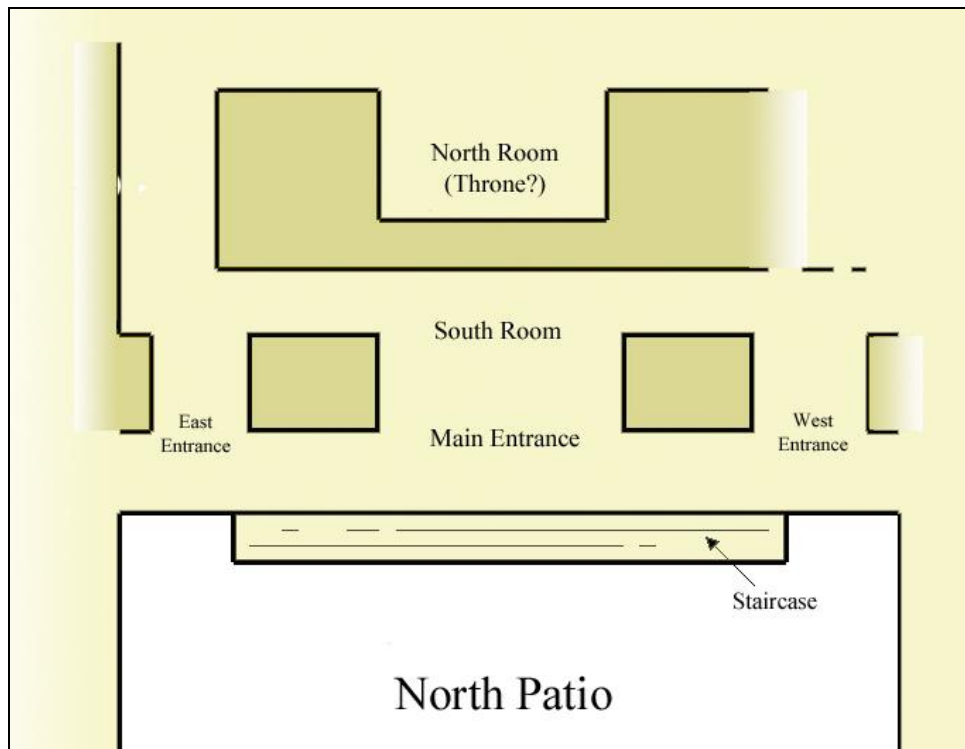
Internal layout of Structure L7-1 (Drawing by M. Callaghan and T. Barrientos, VCAP)
